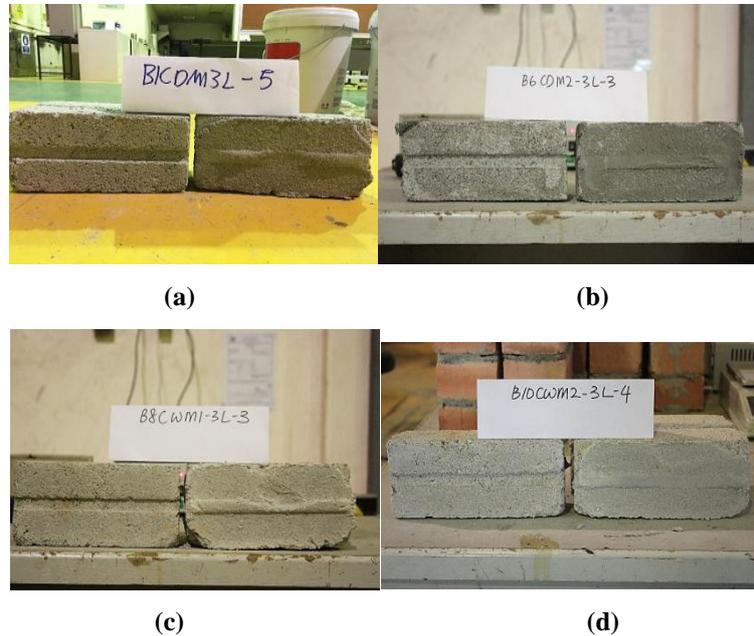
Failure mode of cement-sand masonry (a) CDM1, (b) CDM2, (c) CWM1, and (d) CWM2
